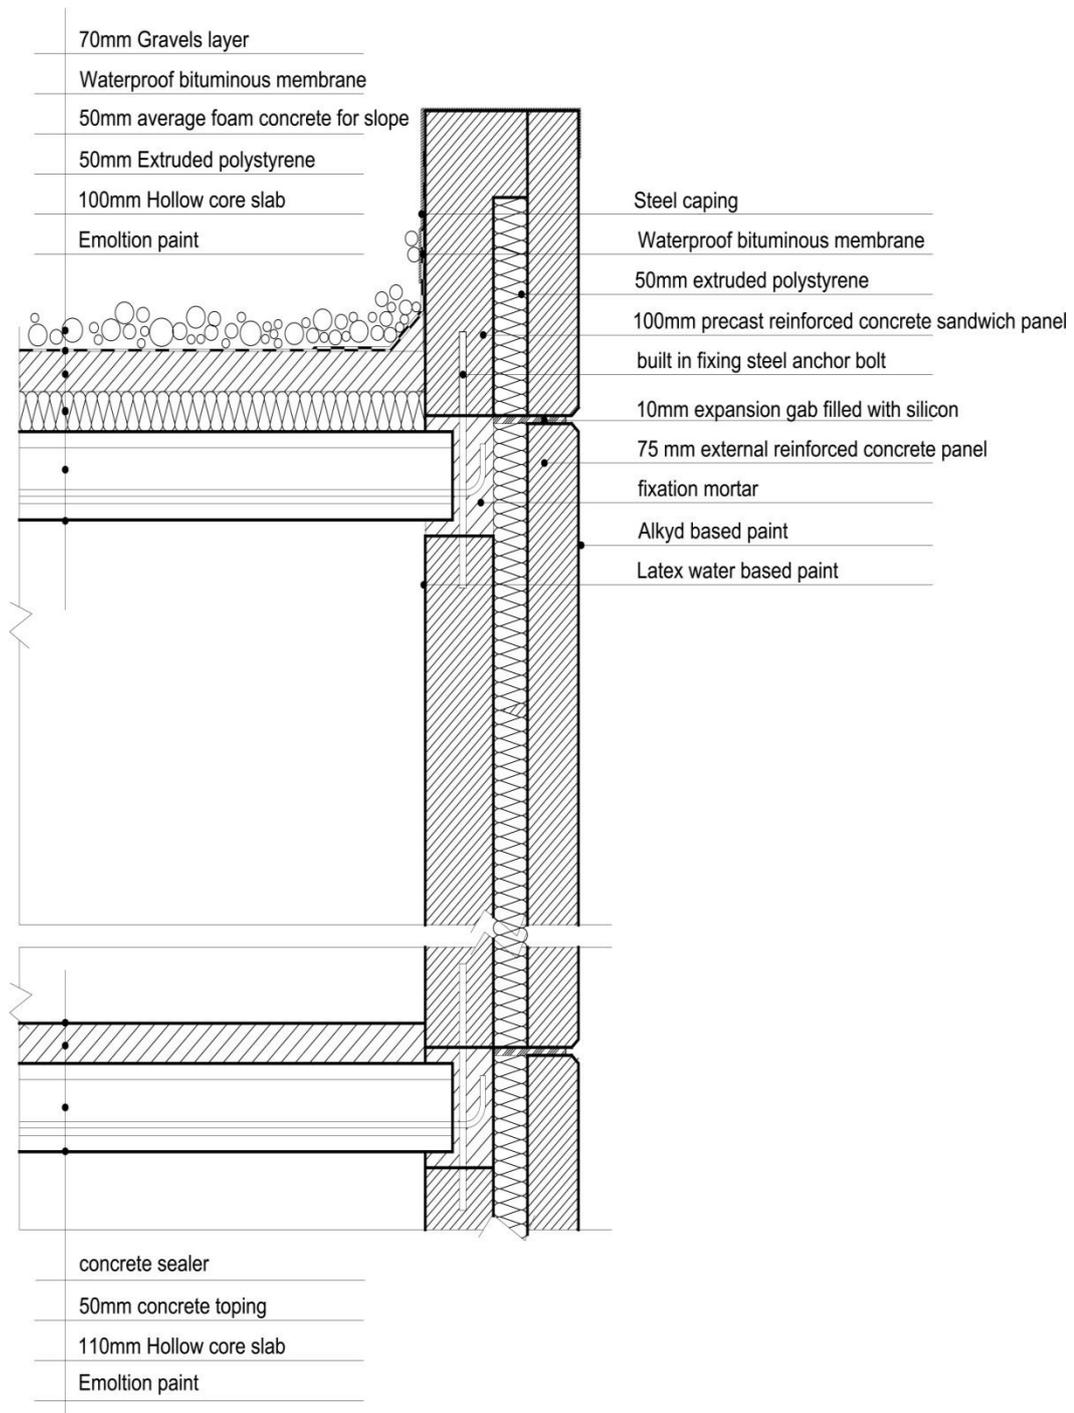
Detailed Wall Section for the Precast Concrete PCC
